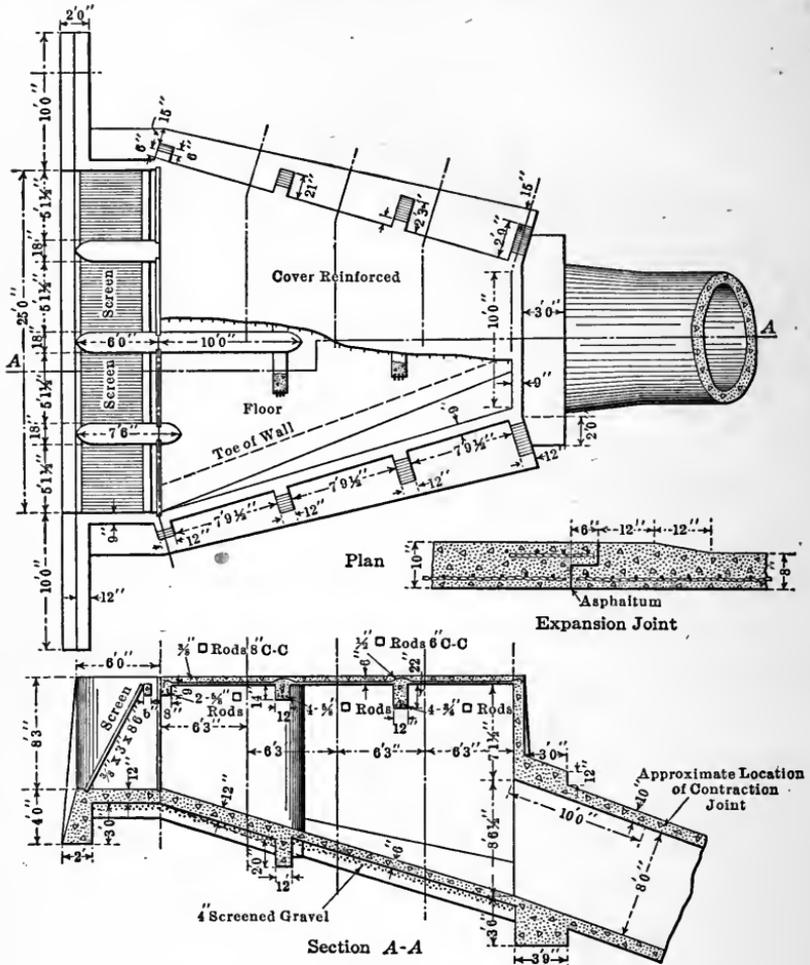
Inlet structure of Anderson Siphon. Belle Fourche Project, S. D.
